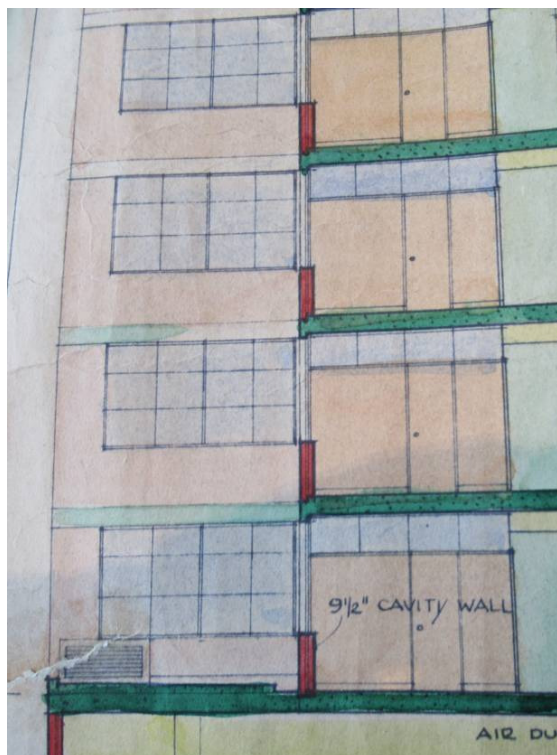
Detail showing typical construction of Light well walls and steel framed glazing
